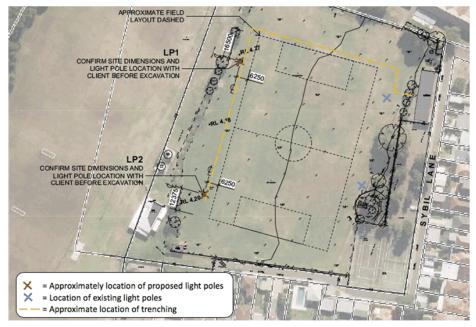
Aerial image of Memorial Park, illustrating location of the two proposed light pole and two existing light poles, existing light pole, and proposed trenching. Source: Submitted Site Plan with DA-2017/156, as adapted by CPS Planning for diagrammatic purposes.
